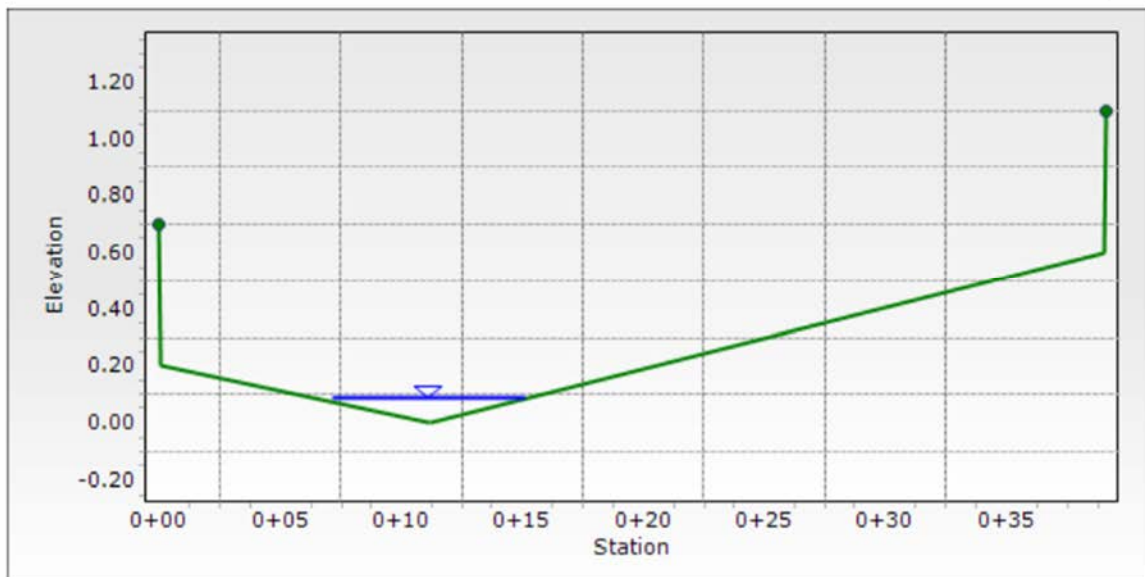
Street Cross Section and Flow Master Results – Cross Section 3
